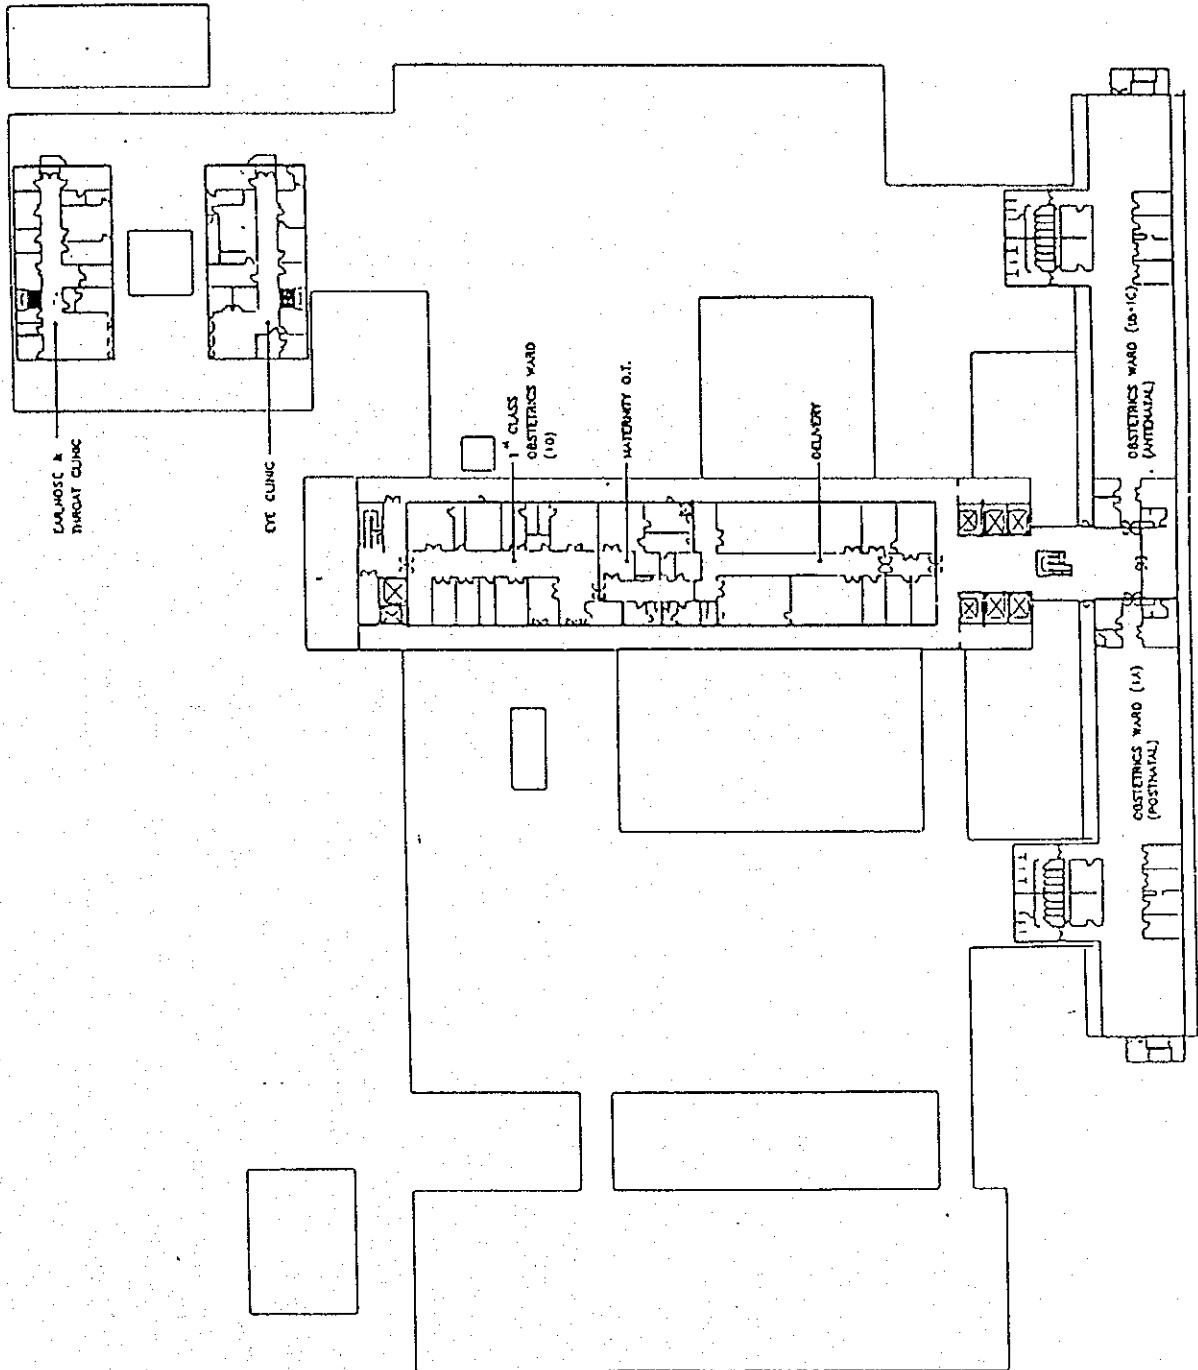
Layout of the Hospital (1st Floor: similar to the 2nd - 8th Floors)
